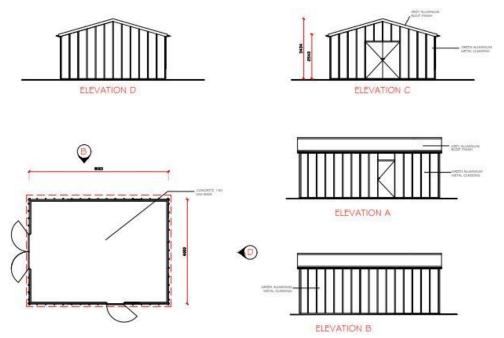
Proposed storeroom floor plan and elevations – current application (23/02527/FULL1).
